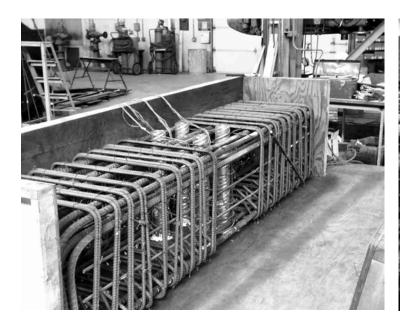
Cast-in-place Bent—Footing and Column Stub Schematic
